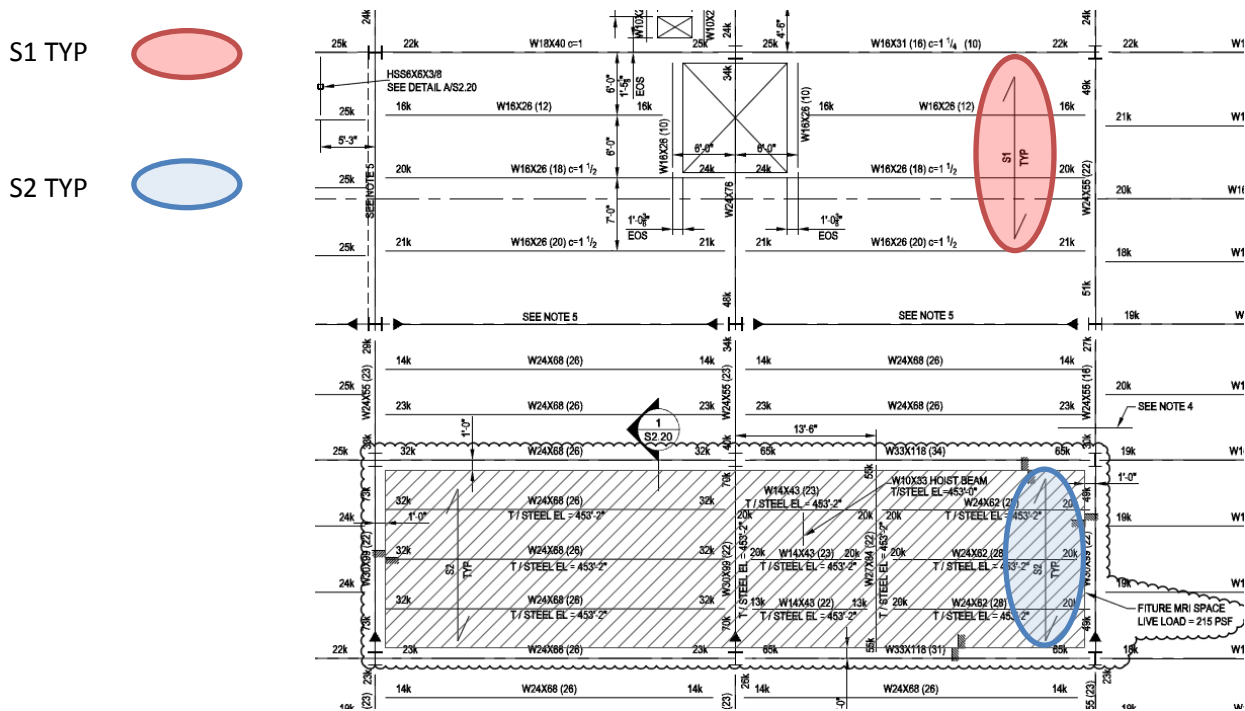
Level 2 Framing Plan (Courtesy of: Gannett Fleming)
